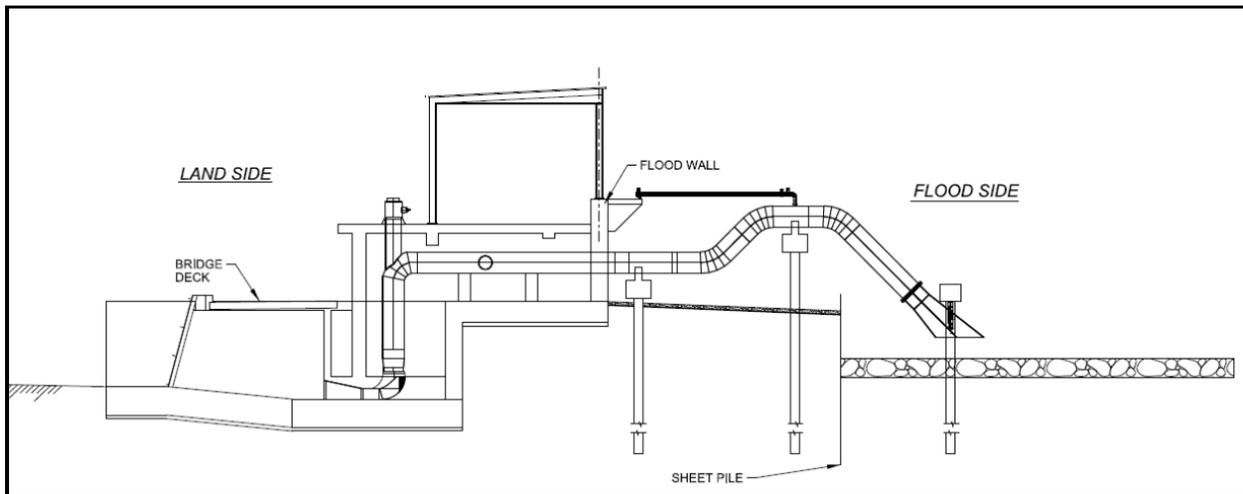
Pump Station Typical Section (Courtesy of USACE-NAO)
